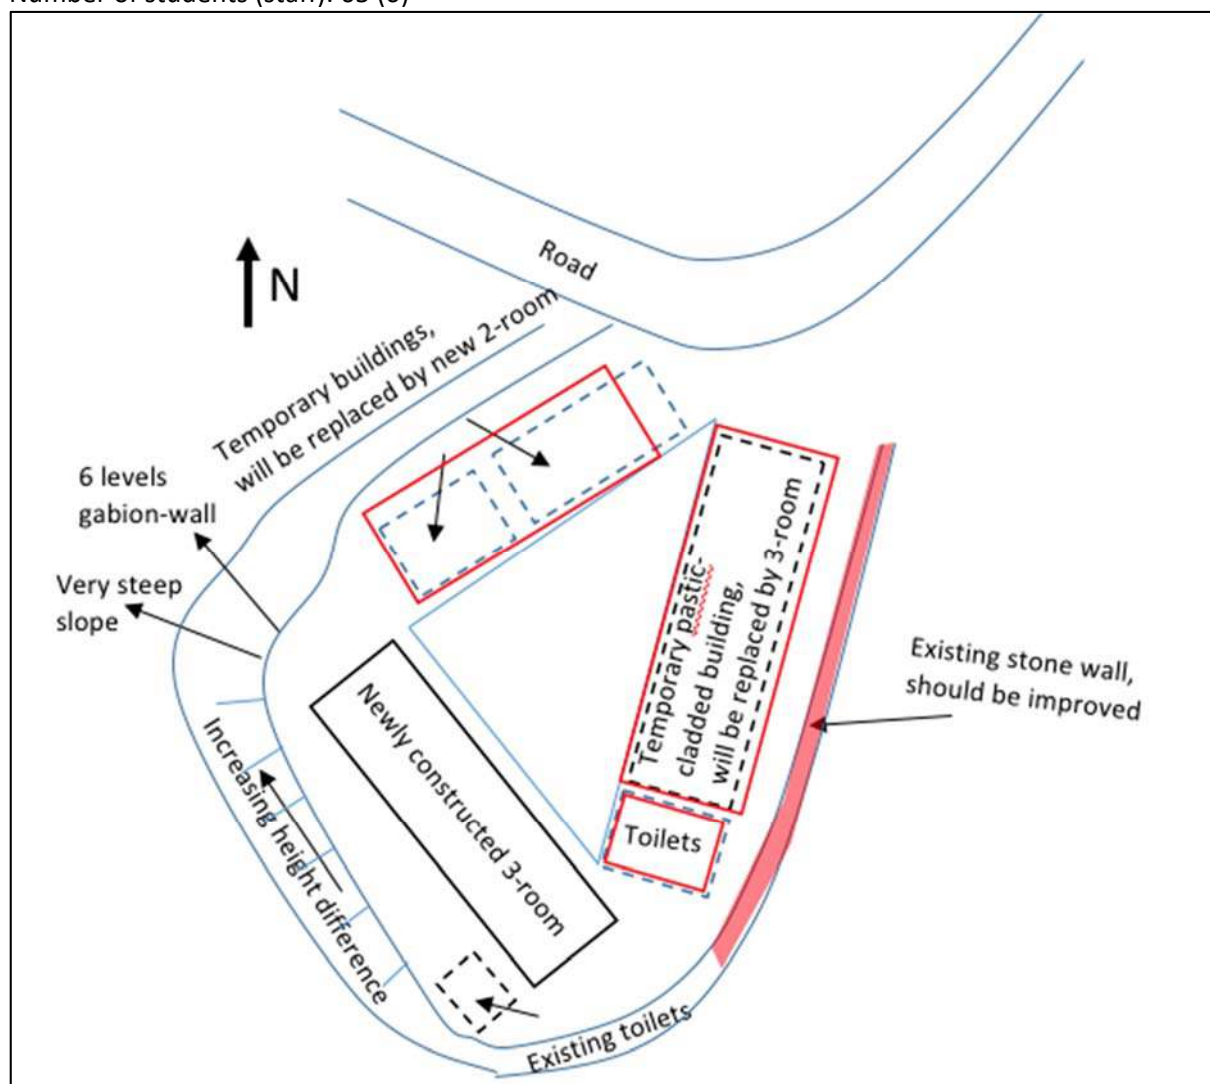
Plan view – Narayani. A retaining wall should be constructed on the east side of the plot. The foundation of the new 2- room building may require a dry stone wall at the border of the school plot.
